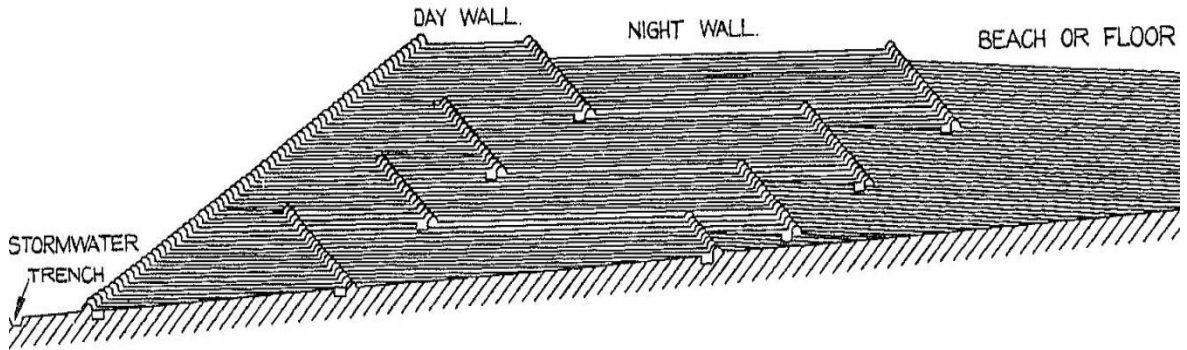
Paddock system of dam construction showing daywall and nightwall (NBRI, 1959)
